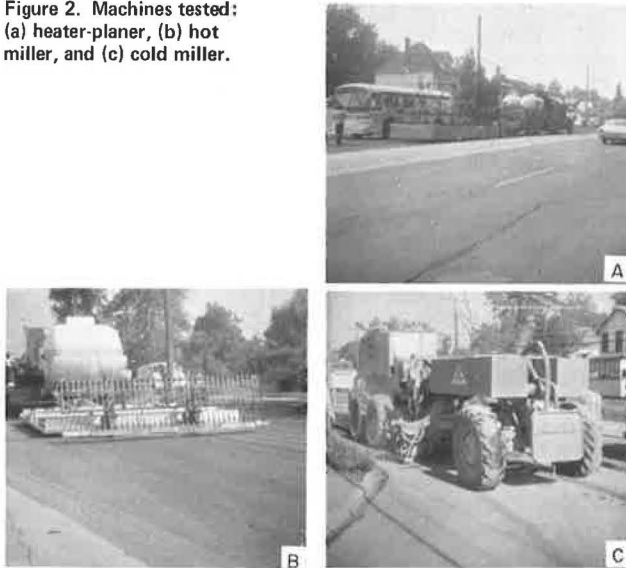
Machines tested: (a) heater-planer, (b) hot miller, and (c) cold miller.
